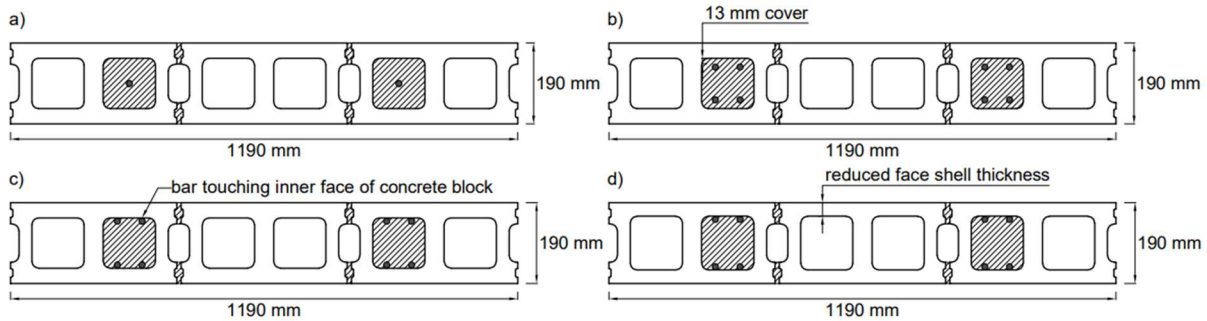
Schematic drawings of cross-sections of the analyzed walls: (a) Section 1, rebar at the centre; (b) Section 2, two layers of reinforcement with 13 mm inner cover; (c) Section 3, two layers with no inner cover; (d) Section 4, CMU with reduced face shell thickness.
